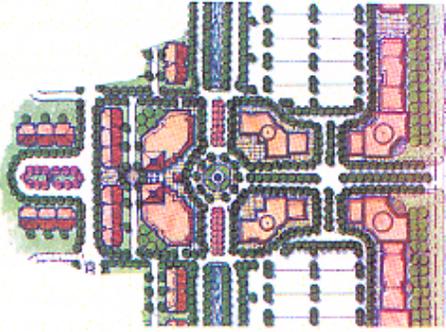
Scenario depicting strong interconnectivity and building placement.
